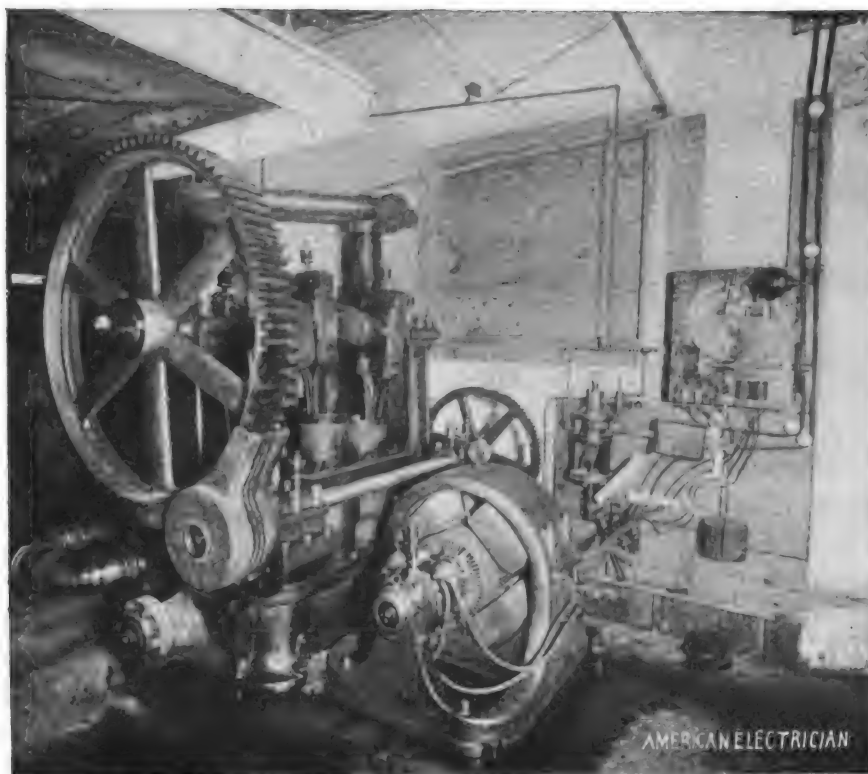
PUMPING PLANT IN METROPOLE BUILDING, CHICAGO.
